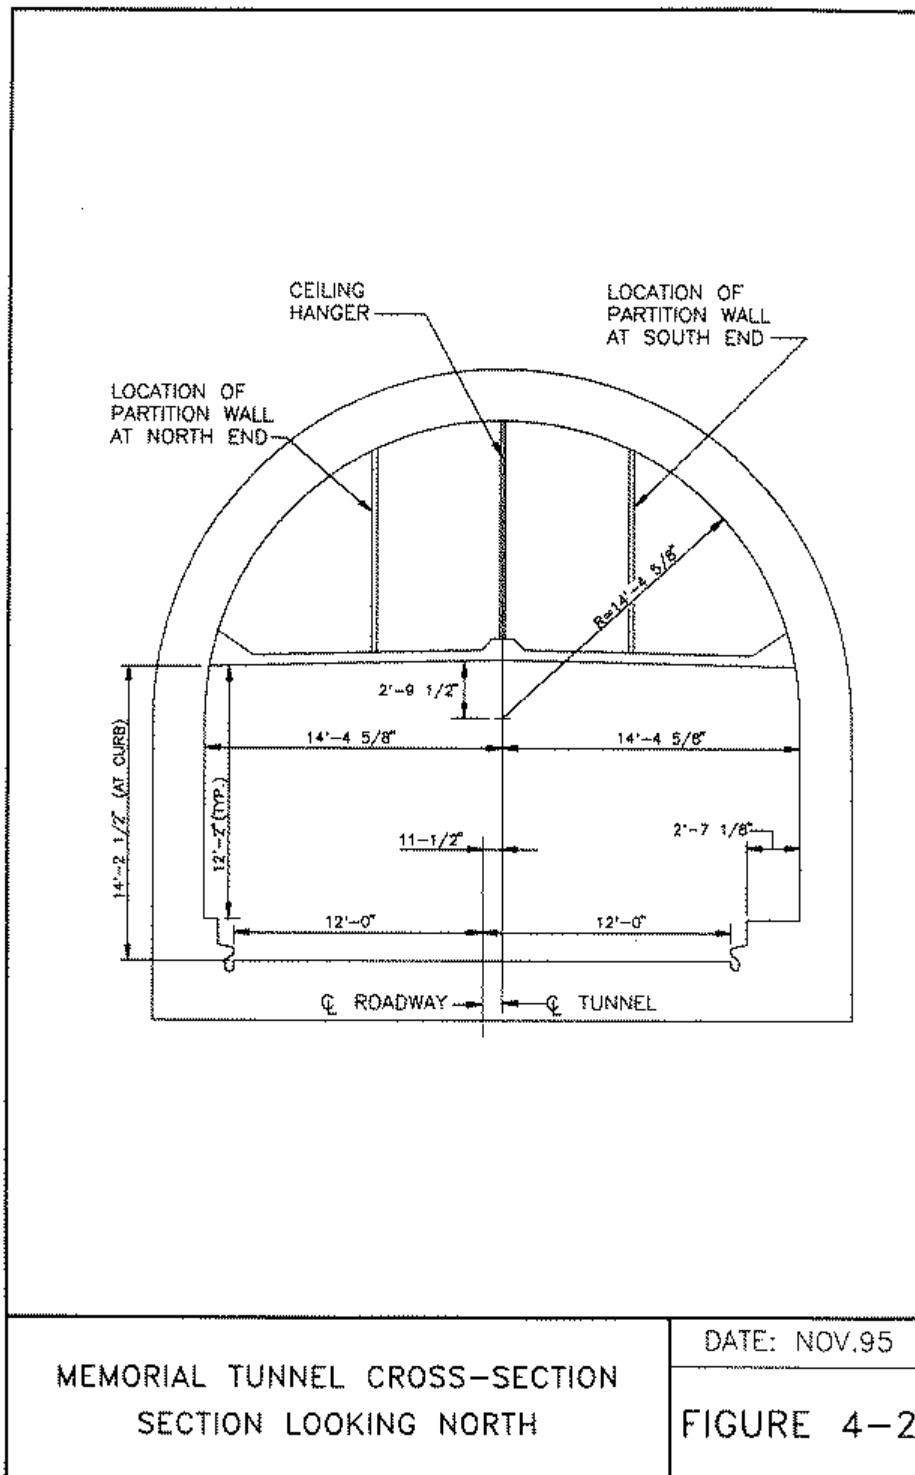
Cross section of Memorial Tunnel, West Virginia, reprinted from Reference [8]. Note that all lengths are reported in units of feet and inches. The height of the tunnel is 7.9 m (26 ft); its width is 8.8 m (29 ft). The tunnel walls and ceiling are constructed of concrete. In comparison, the Howard Street Tunnel in Baltimore is approximately 6.7 m (22 ft) high, 8.2 m (27 ft) wide, and lined with brick.
